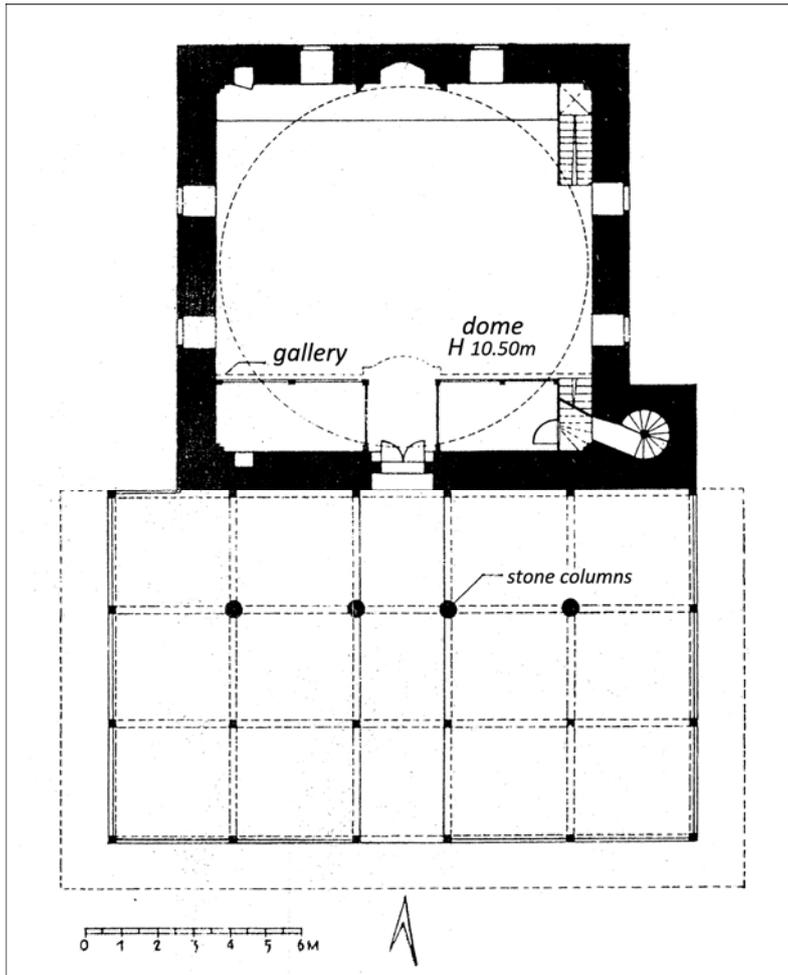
Floor plan of the mosque of Ali Bey (plan after D. Popov)
